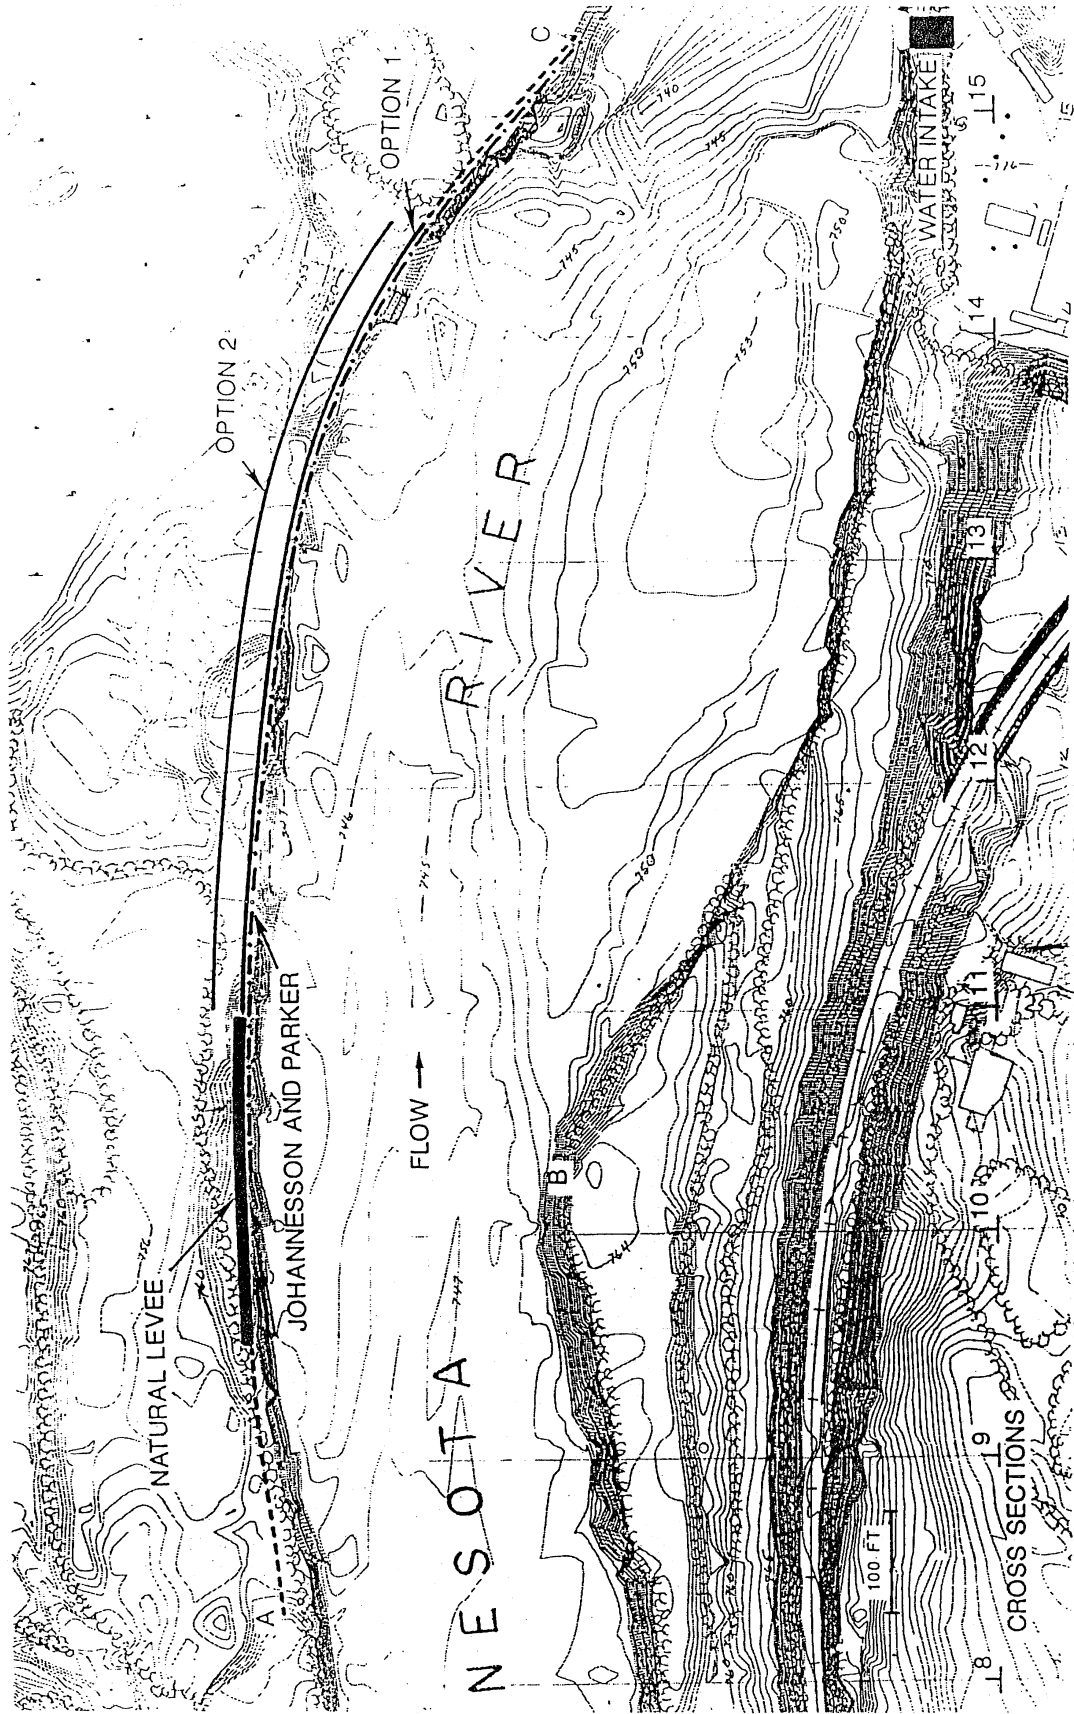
Various options shown in plan for rebuilding the west bank with a levee.
